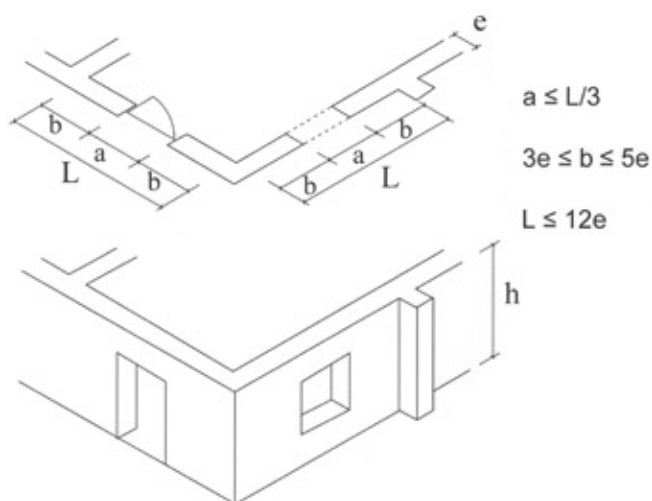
Code specifications for wall openings (L = length of wall, a = opening length, b = distance from opening to corner of reinforcement, e = wall thickness, and h = wall height).
